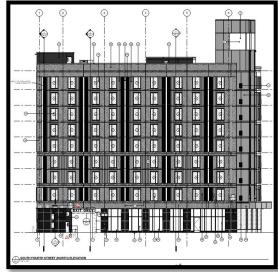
The north elevation reveals the aluminum storefront system as well as the vertical metal panels and windows surrounded by stucco.
